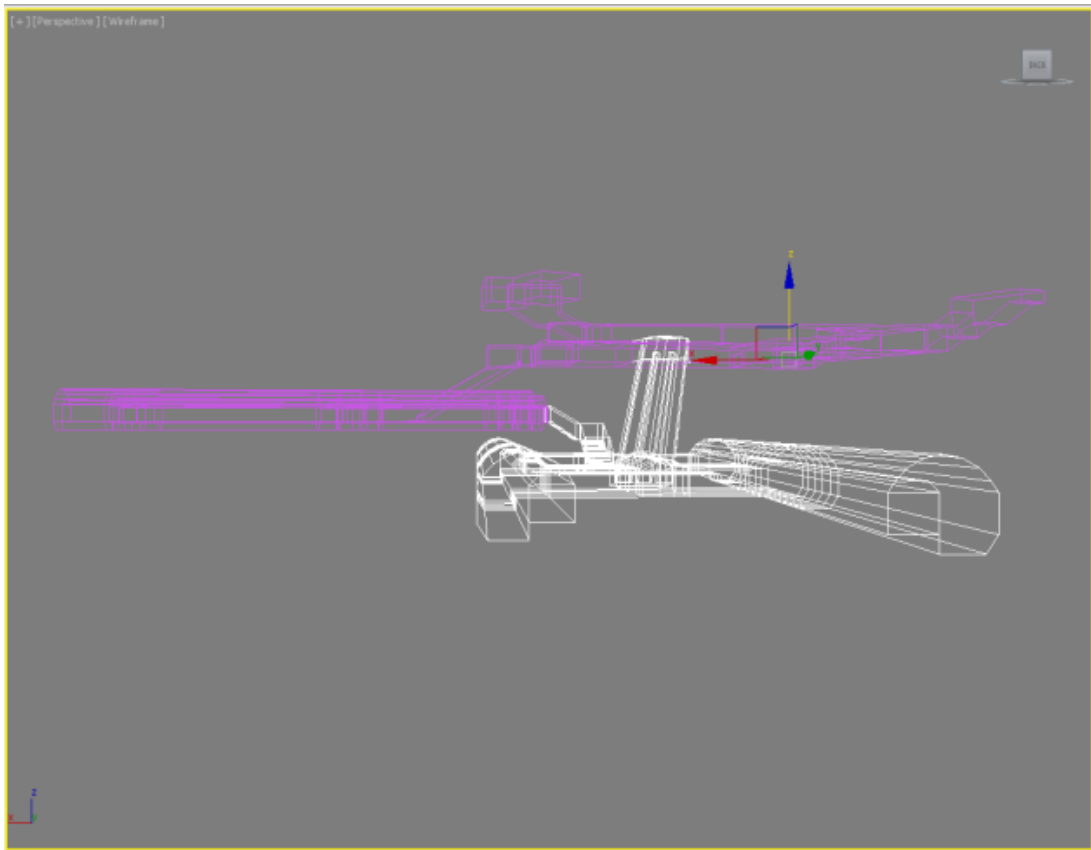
Polygon frame model of the whole station highlight (white) NS tunnel (side elevation)
